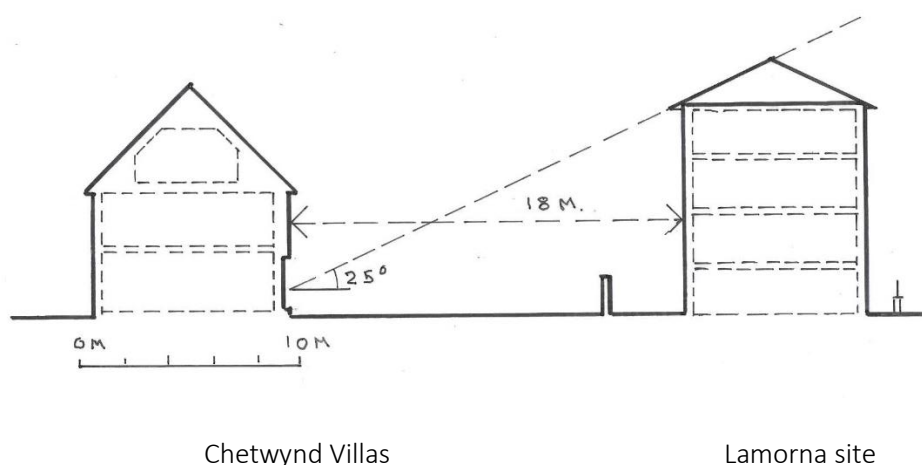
Section through the Lamorna site showing the maximum accommodation that could be placed on the site while respecting Camden's good practice planning guidance on Daylight, Overlooking and Privacy in relation to Chetwynd Villas on Chetwynd Road.
